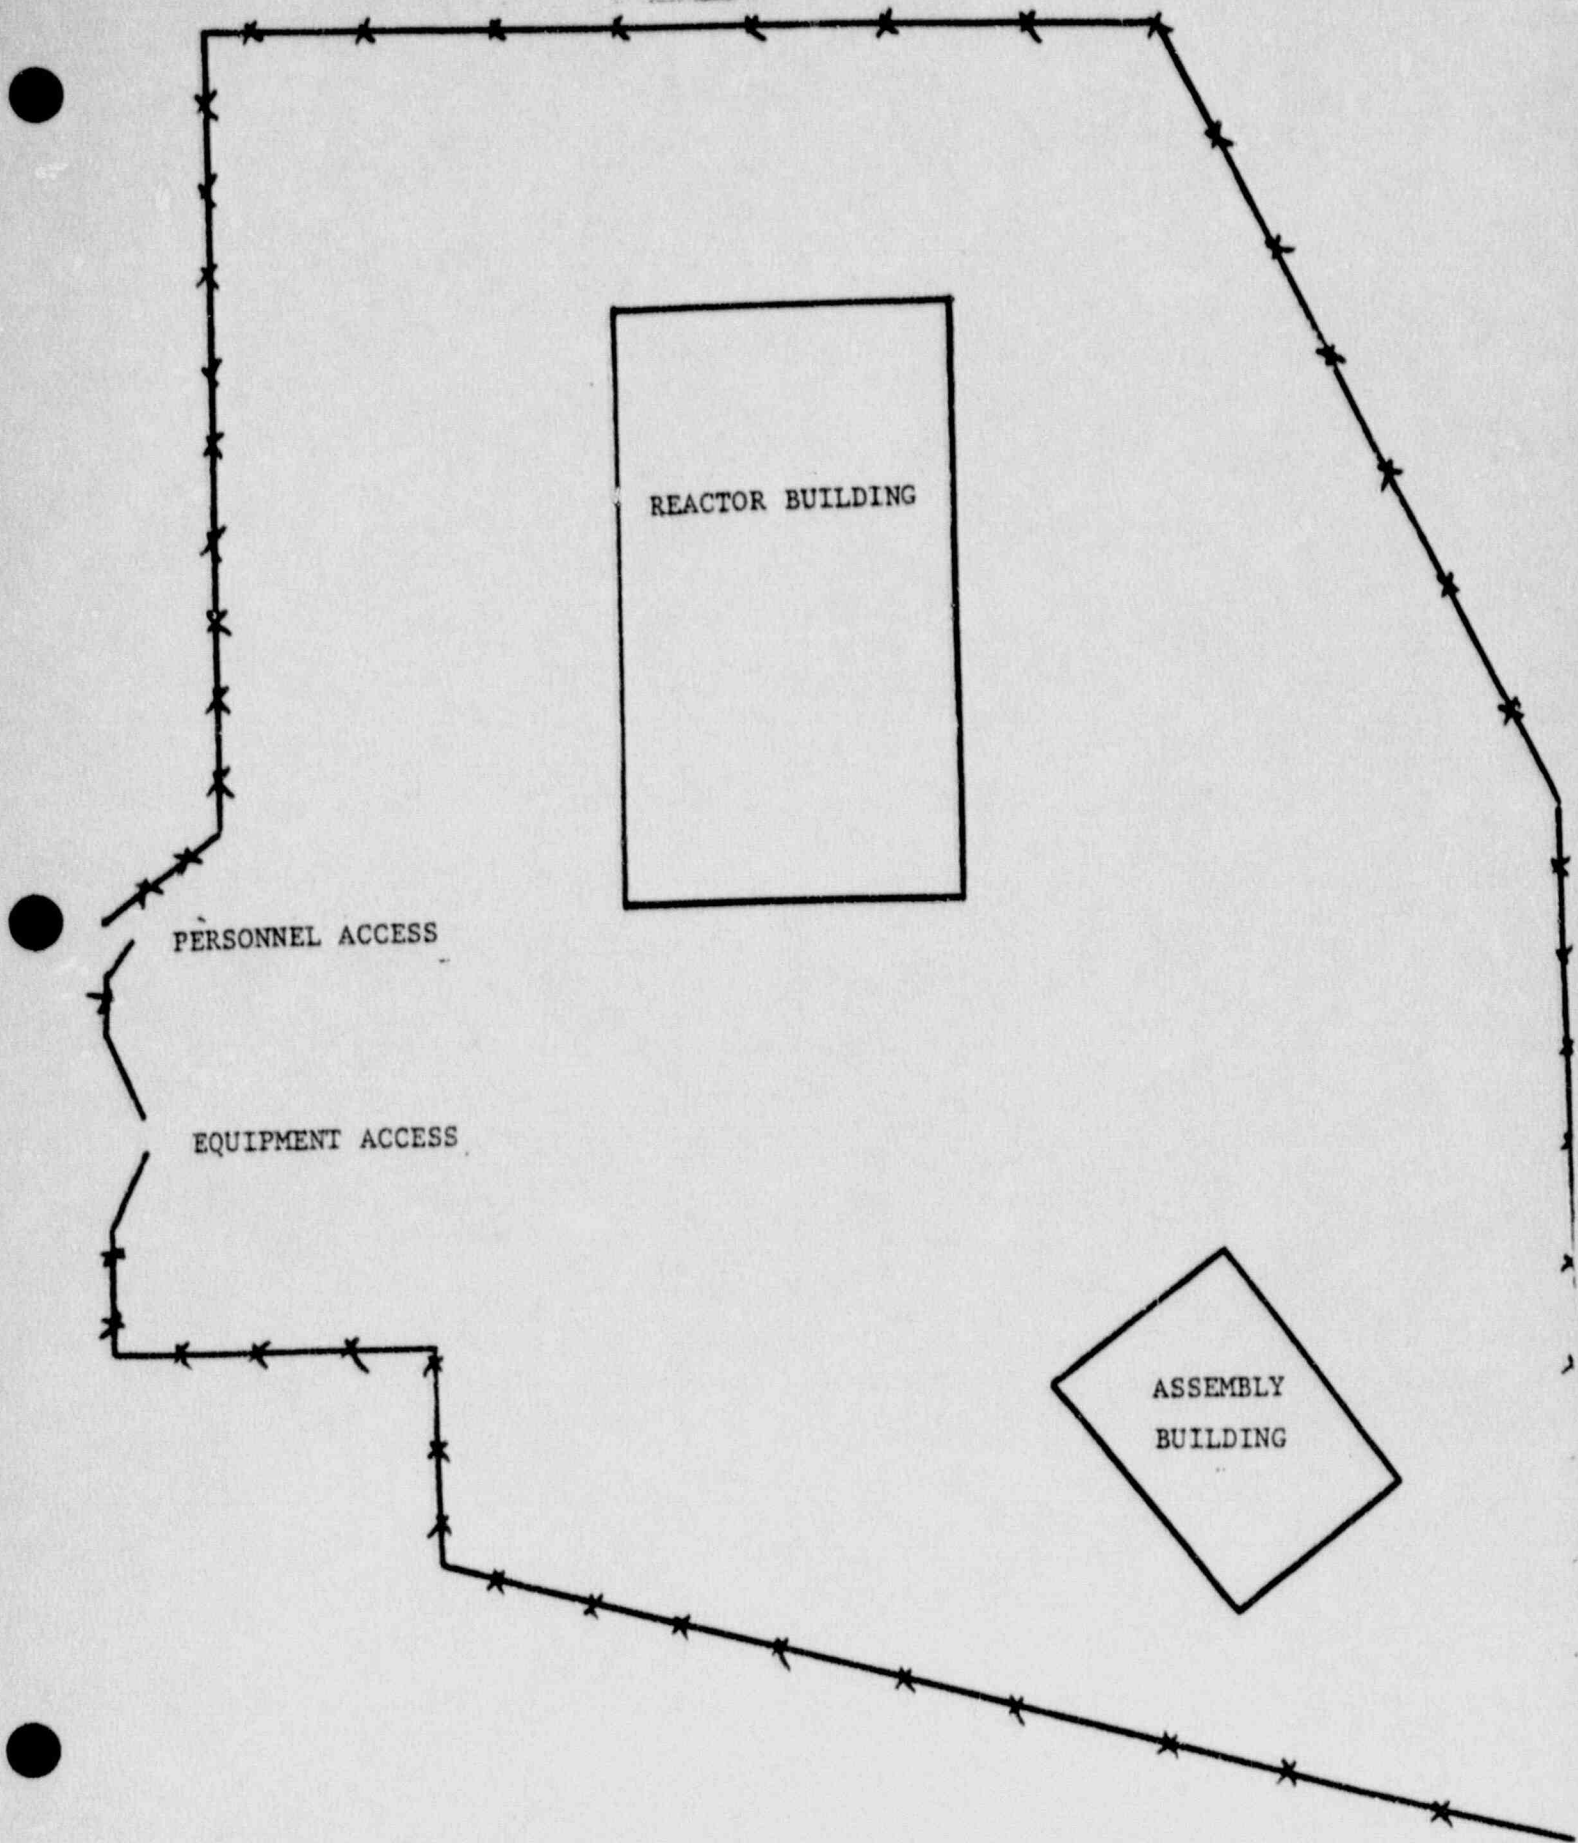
ECF FACILITY FENCE & BUILDING LAYOUT
